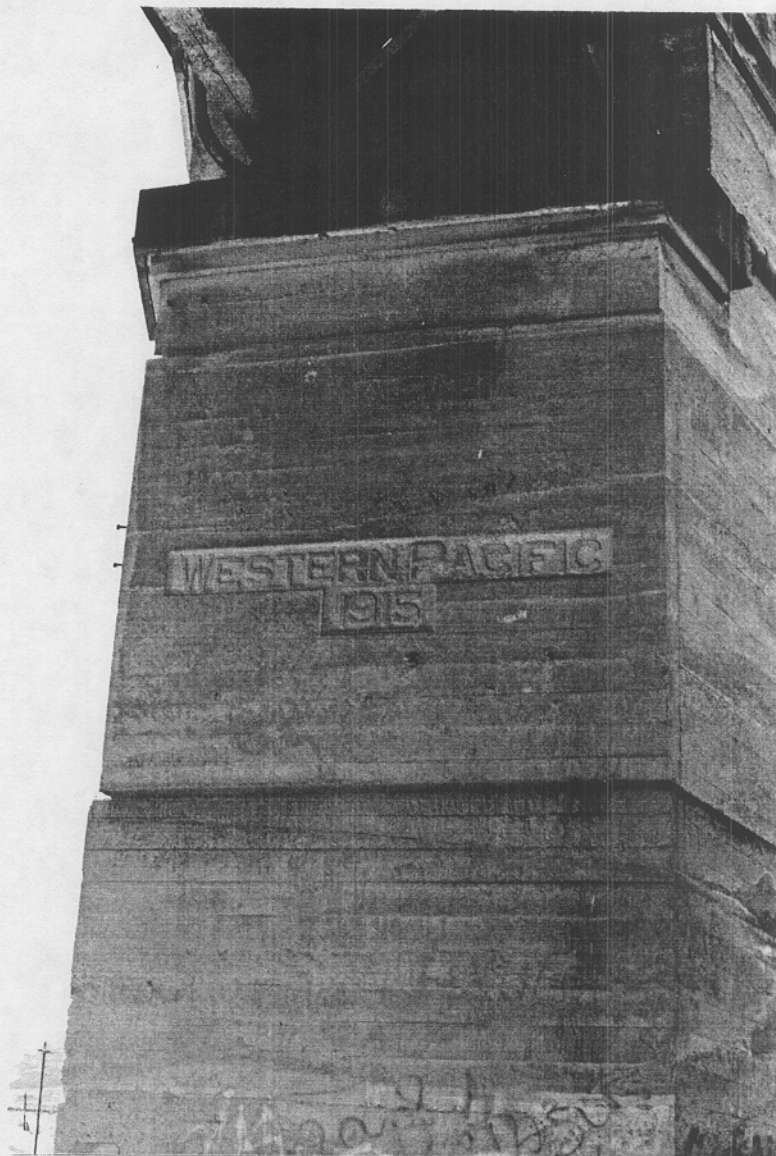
Altamont Pass Road Underpass Bridge (view of abutment)
